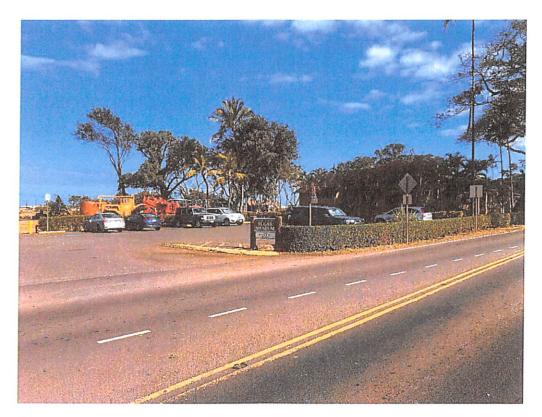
Photo A: View of Museum Parking Lot Entrance from Hansen Road
